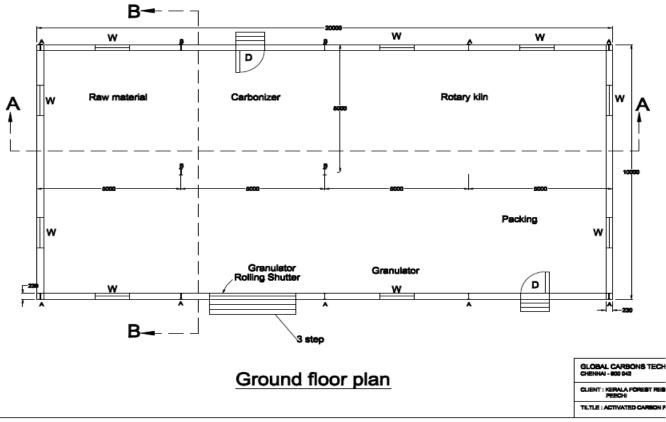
Ground Floor Plan of Carbonizing Plant
